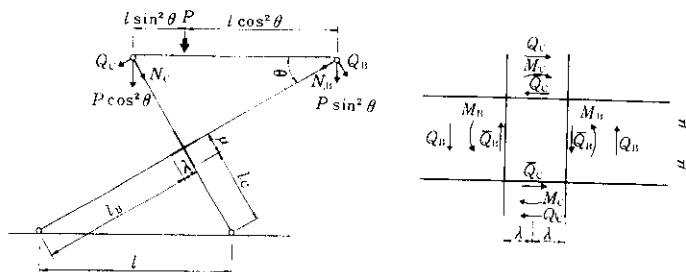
Idealized loading on X type specimen and forces acting on the beam-to-column connection
